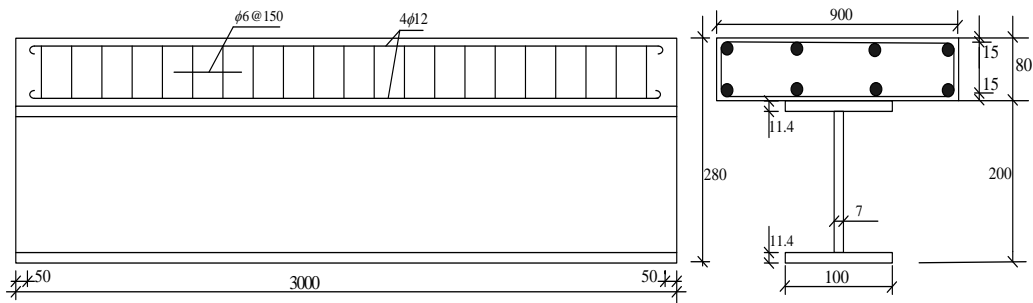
Geometry size and cross-section diagram of the specimen (unit: mm)
